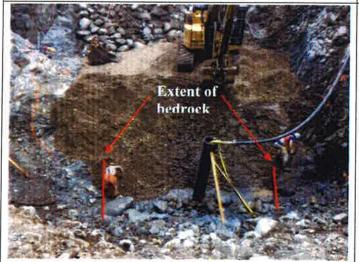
Trenched viewed from cofferdam, showing slope prep and narrowing of channel between canyon walls.
